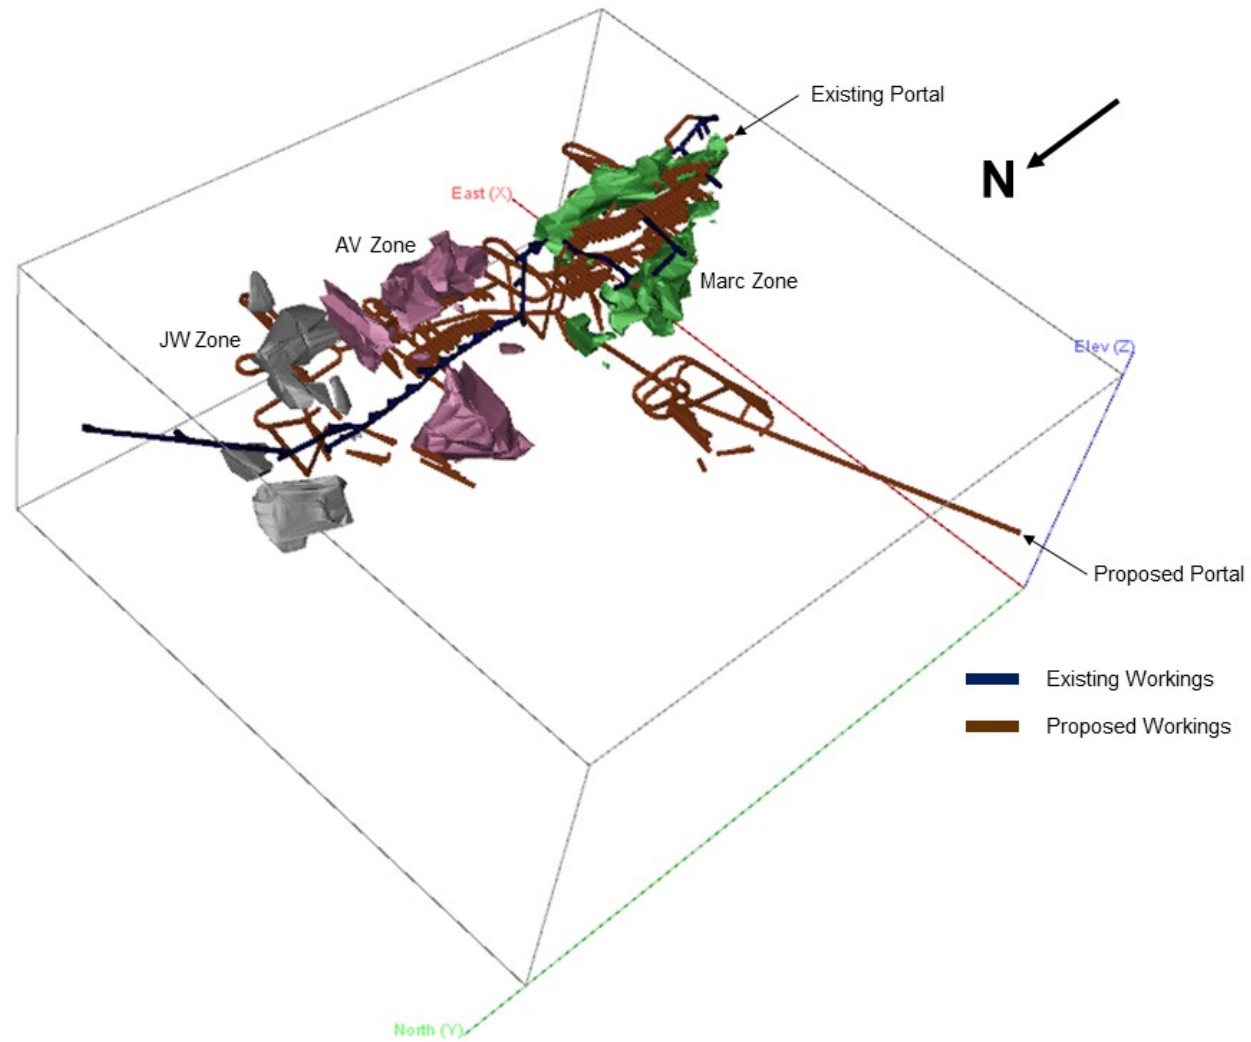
illustrates the currently proposed mine plan, historic underground workings, and the geochemical sample set (i.e., both drill core samples and blast round samples collected during development of the underground). The proposed mine plan makes use of the existing portal, and includes a second portal located at a lower elevation, which is accessed by the main haul road.
